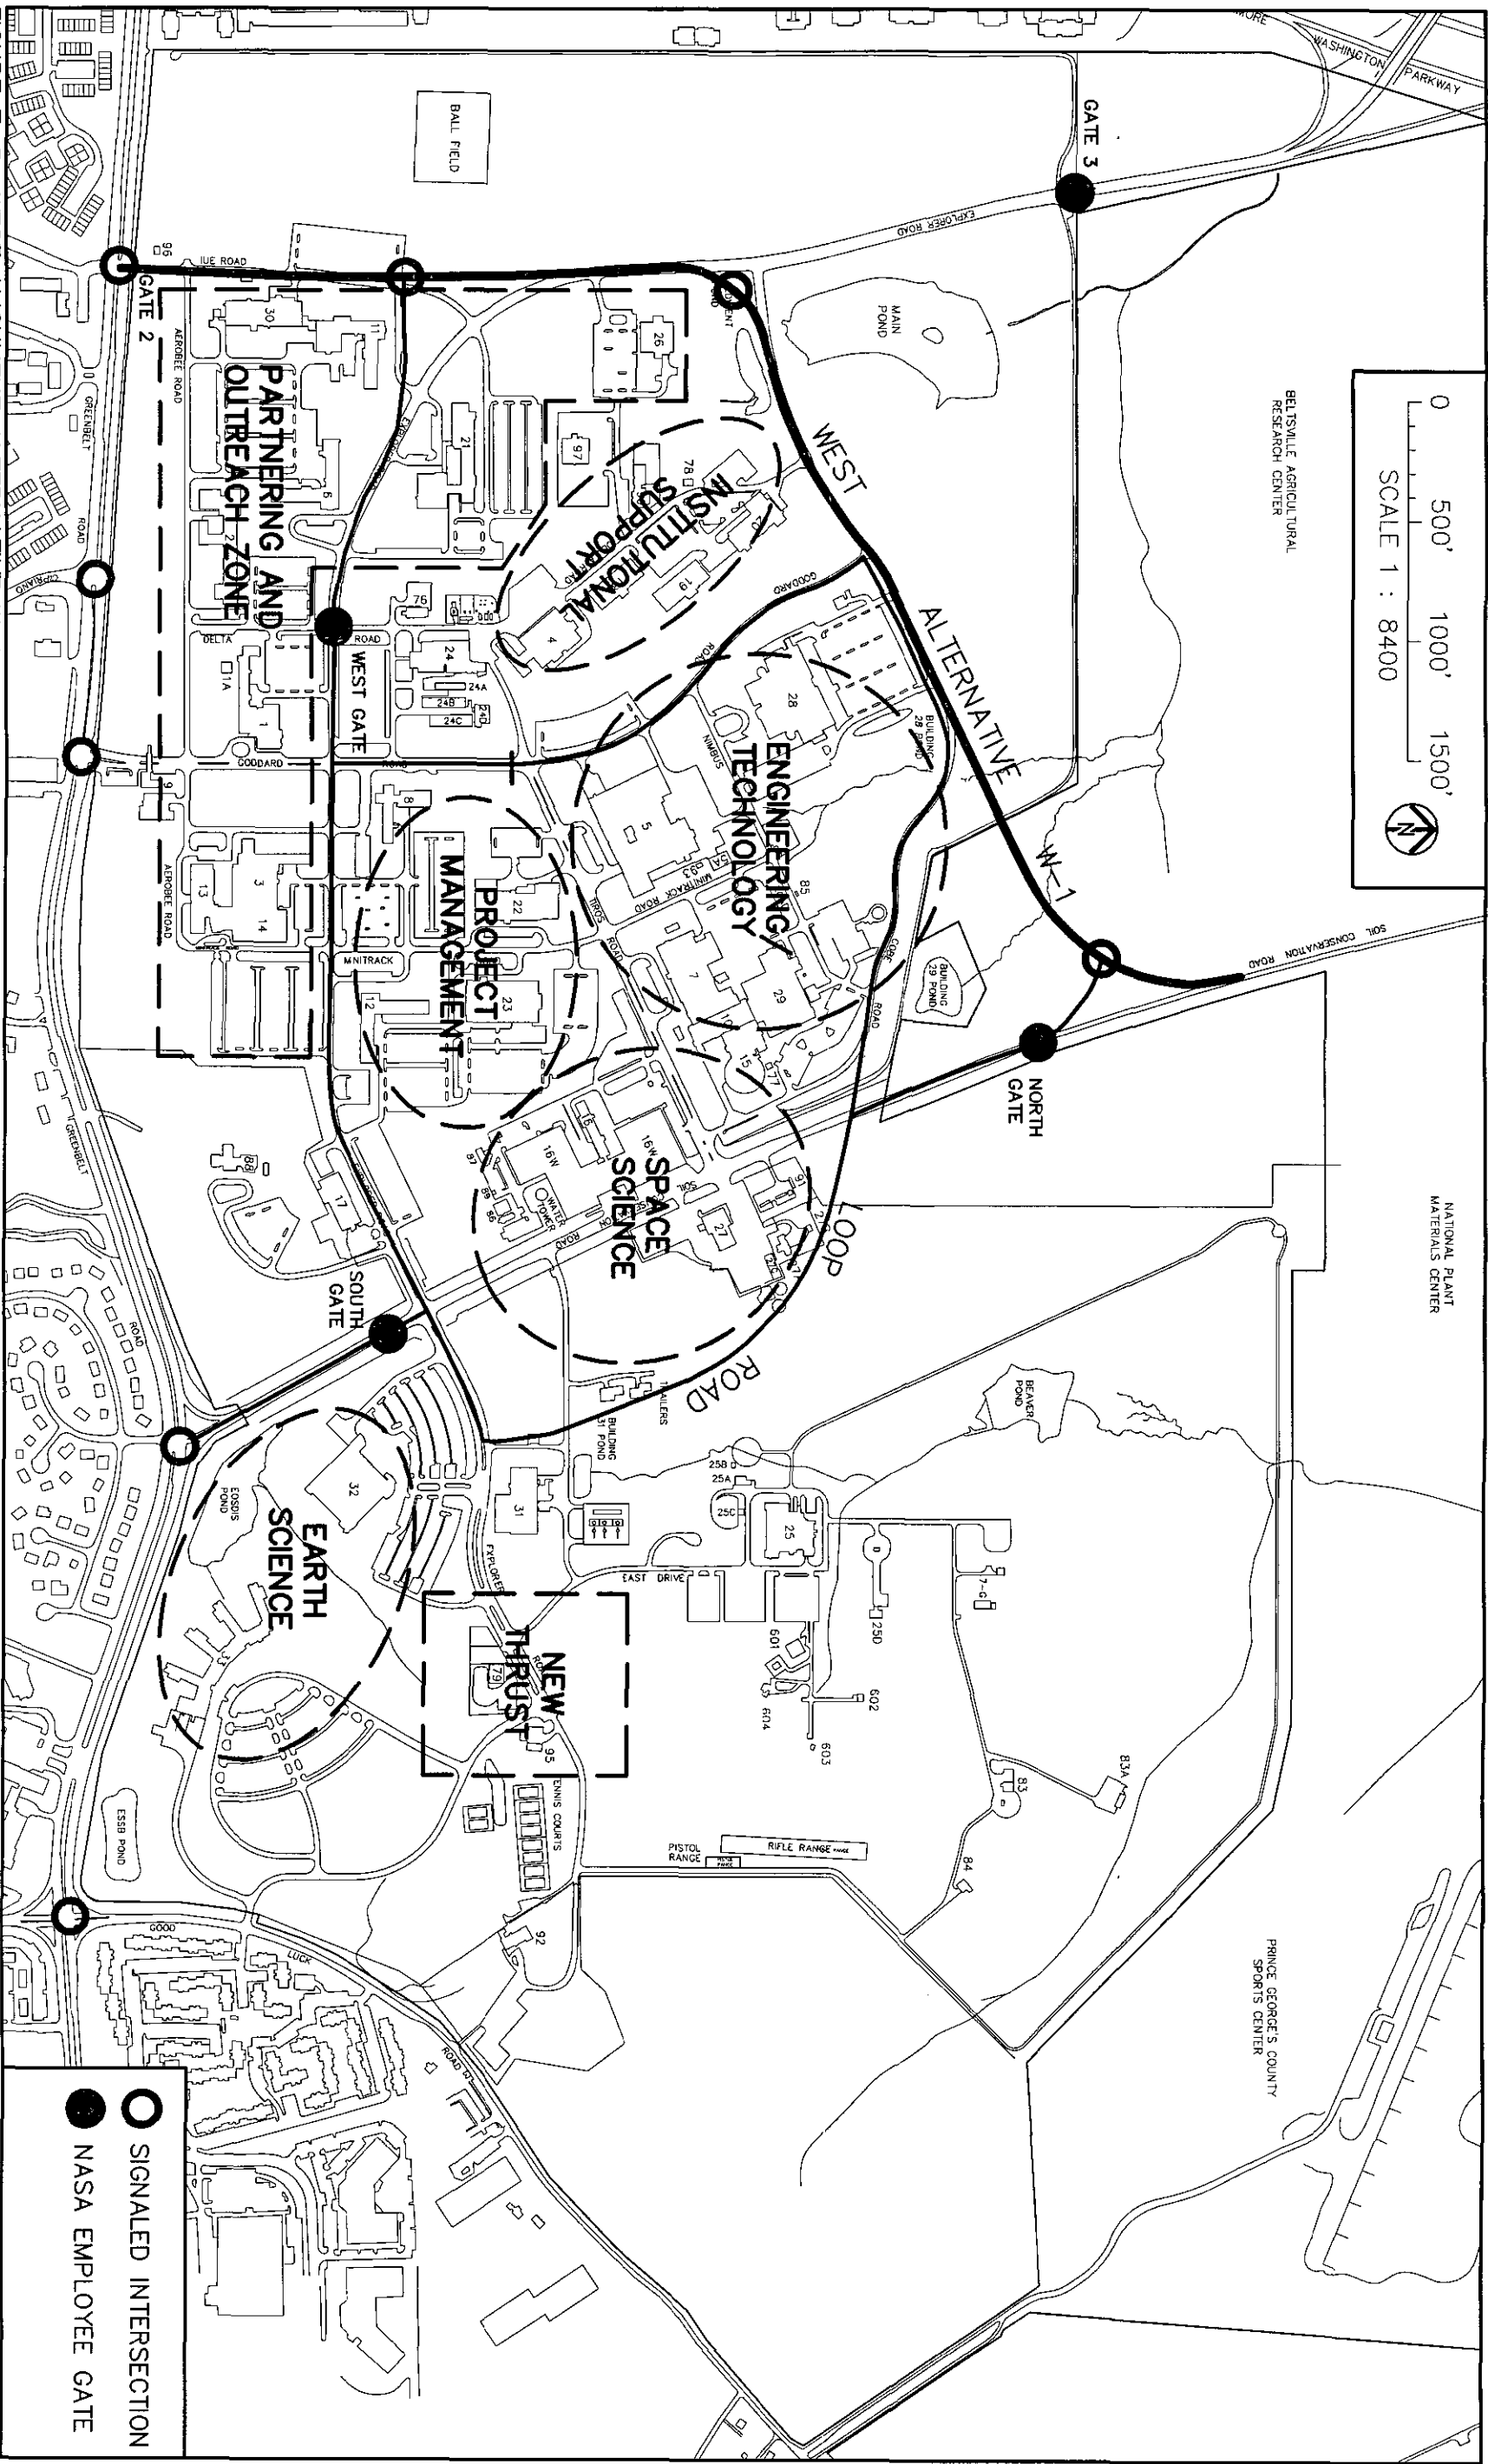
WEST ALIGNMENT ALTERNATIVE W-1.
